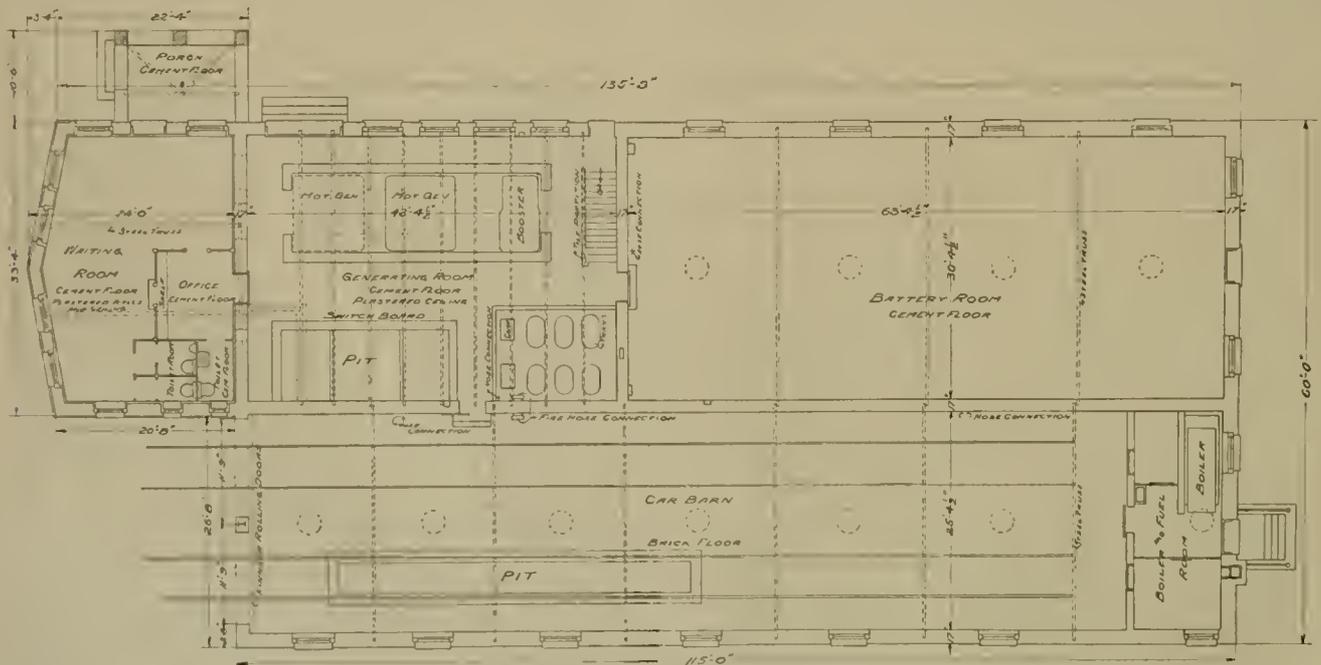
FIRST FLOOR PLAN, LEMONT SUB-STATION.
